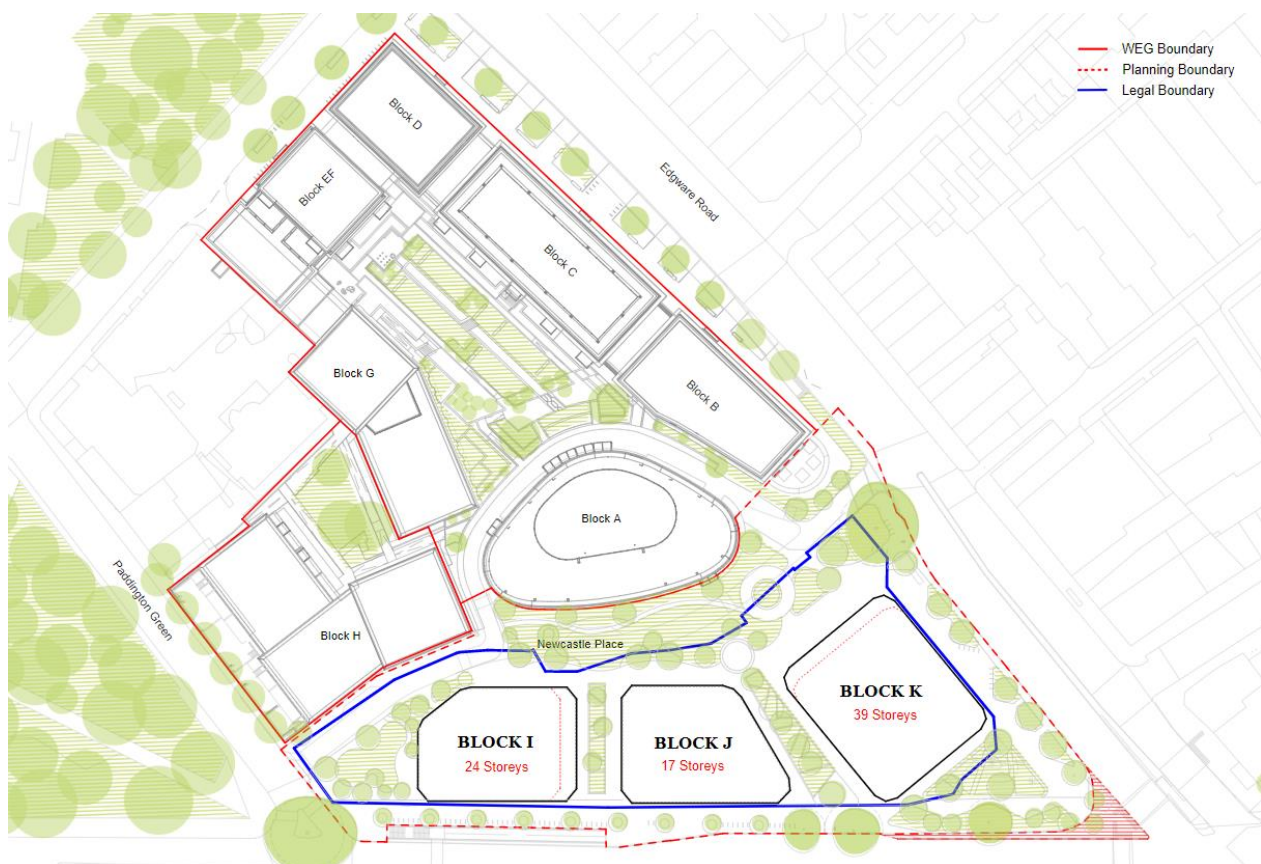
Roof View showing the West End Gate Masterplan with the Proposed Development
